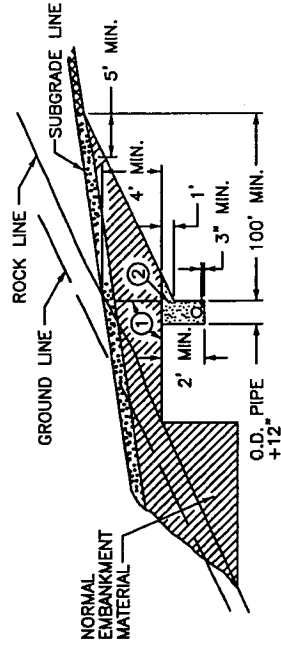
DETAIL FOR TRANSVERSE UNDERDRAIN CUT TO FILL CONDITION
